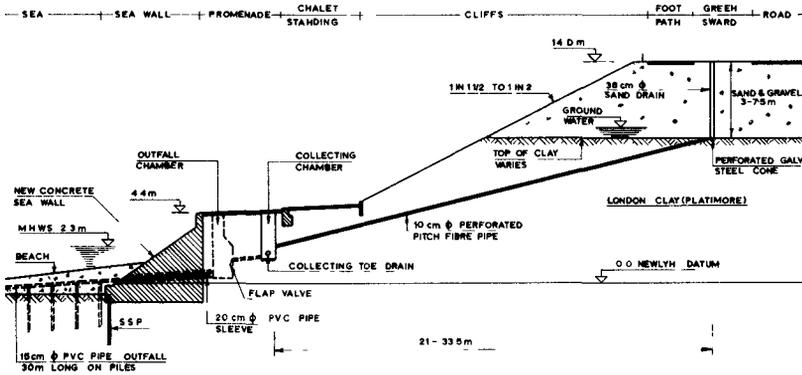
SECTION THROUGH THE CLIFF SHOWING THE DRAINAGE SYSTEM
